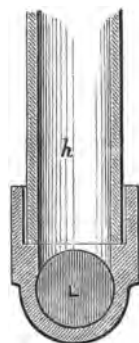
Joint of Heating Pipe in Lying Pipe.
